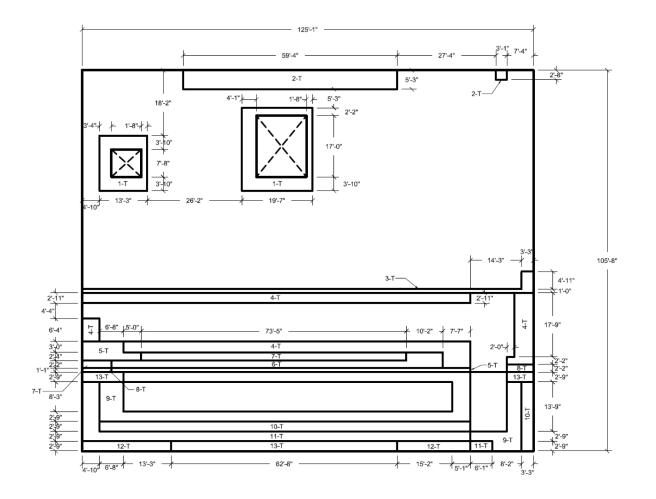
H.3-22 East Wall Looking West Transverse Reinforcement Zones
